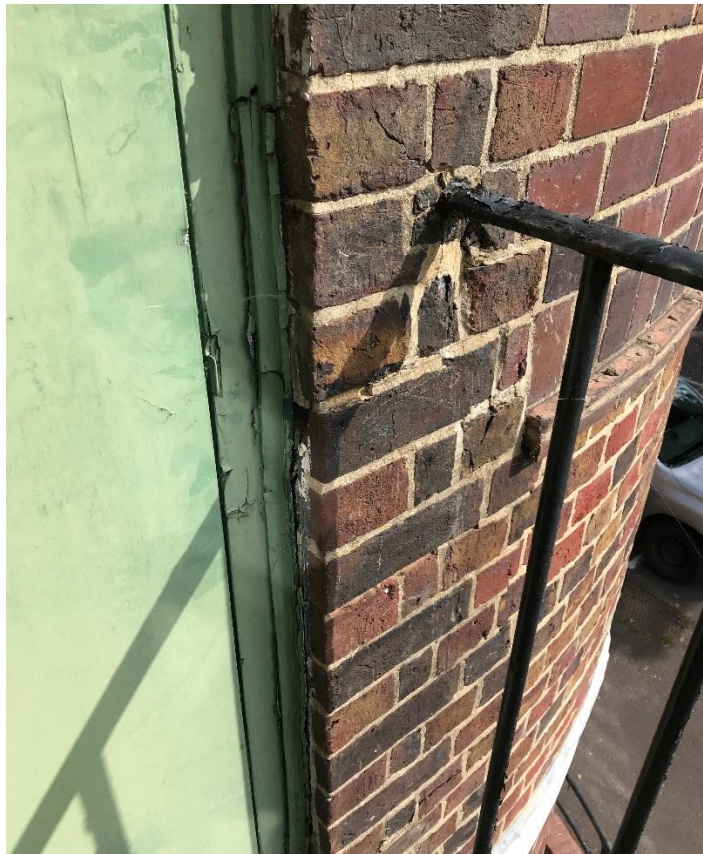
Corroding/expanding metalwork, local cracking of brickwork.
